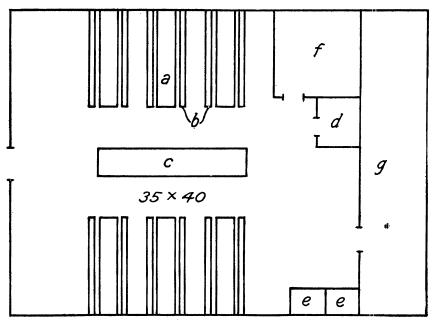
Dryhouse at Virginia, Minn., Mesabi Range: a, Double row of lockers; b, benches; c, wash trough; d, shower room; e, wash tubs; f, captain's room; g, boiler room.
